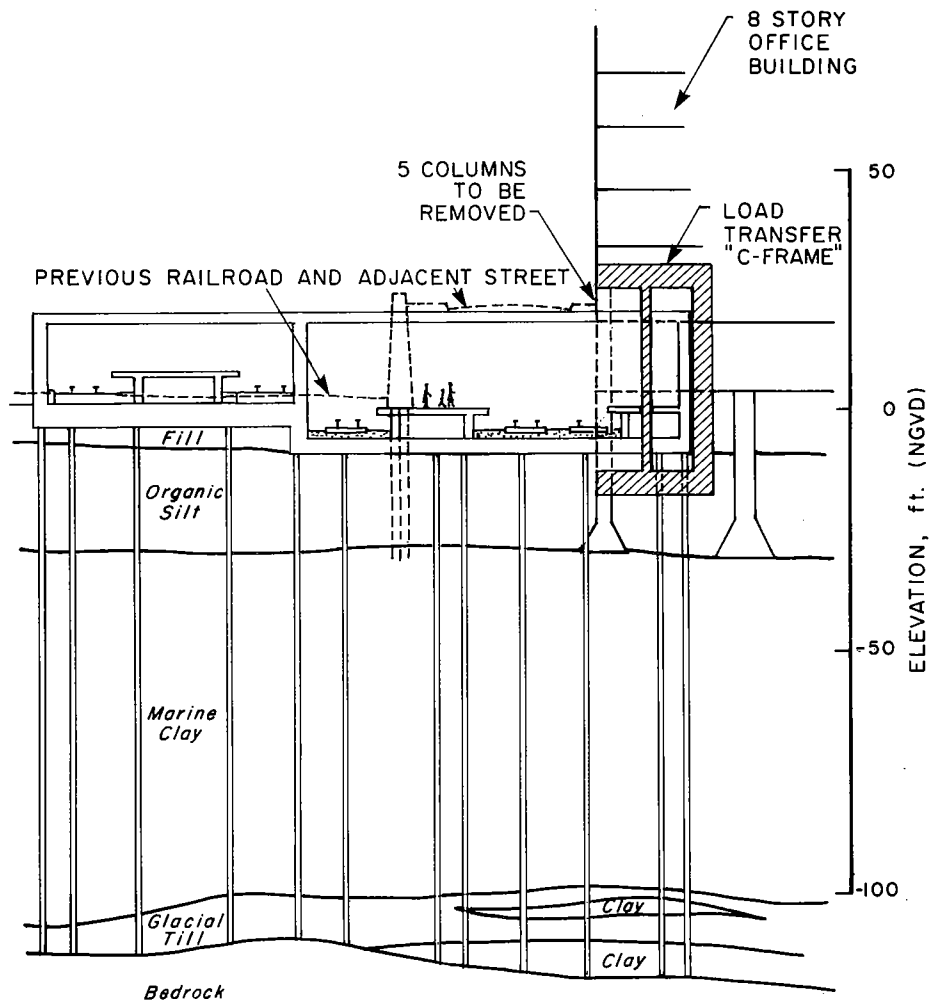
Cross-Section of the Corridor Structure Showing Required Building Underpinning in Back Bay Station Area
